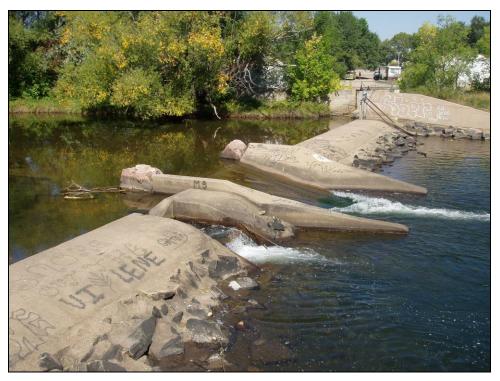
Reconstructed boat chute and fish passage downstream of College Avenue.
